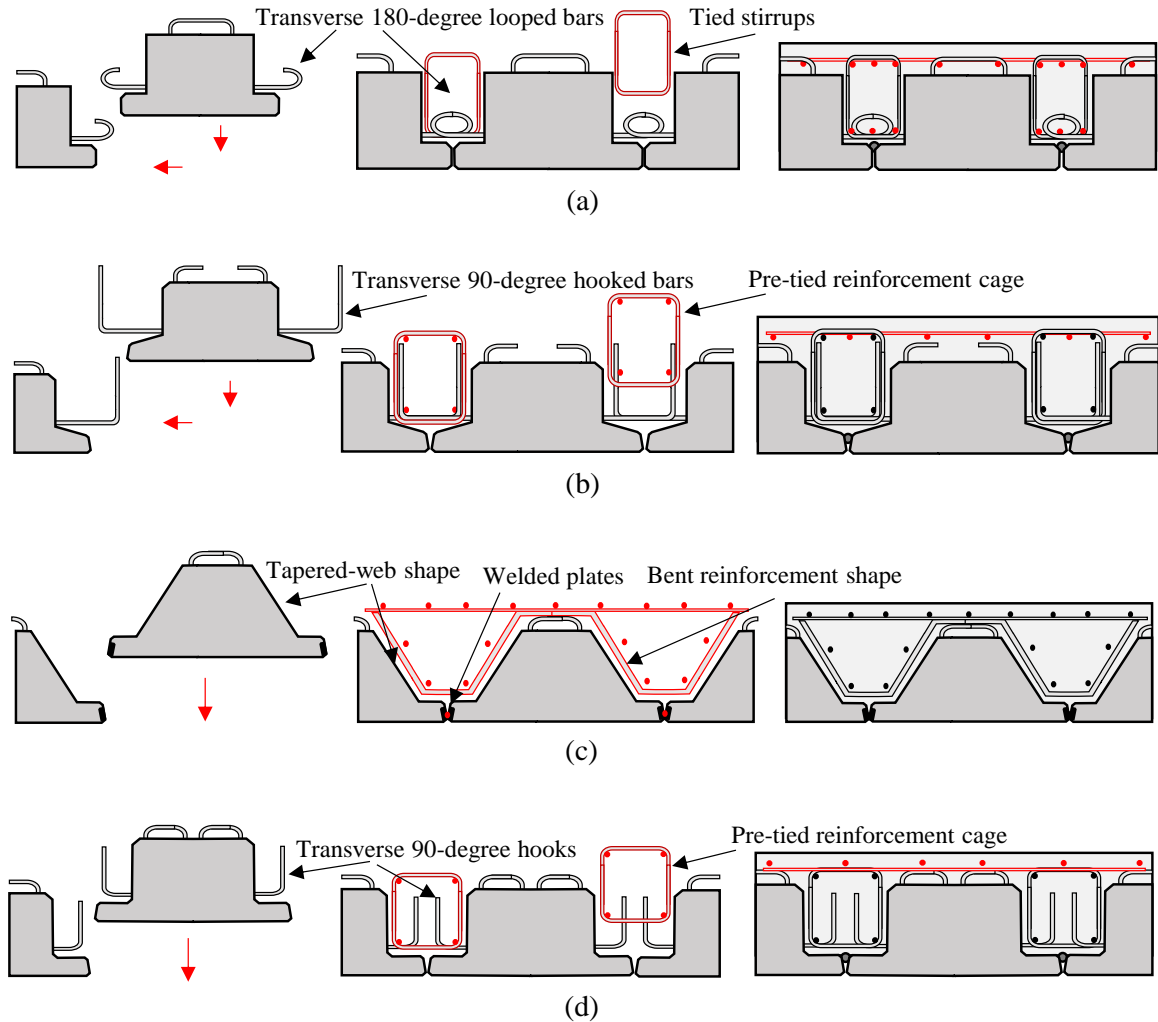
Joint system and CIP concrete topping system construction for: (a) Poutre-Dalle (French slab beam), (b) Minnesota PCSS, (c) Virginia inverted-tee, and (d) Florida Slab Beam
